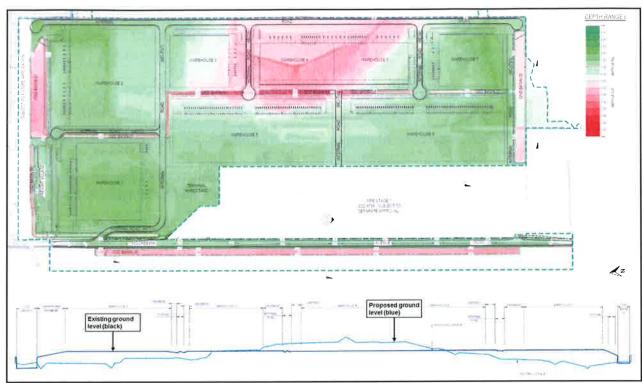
Proposed location and predicted depth of cut and fill (top) and east-west section through the site indicating the existing proposed land height (Base source: Applicant's EIS)
